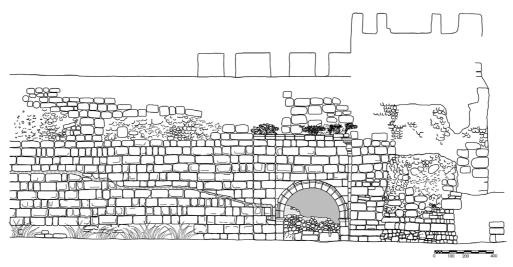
Curtain wall and Gate. West façade (Ş. Güvenç Duran).
